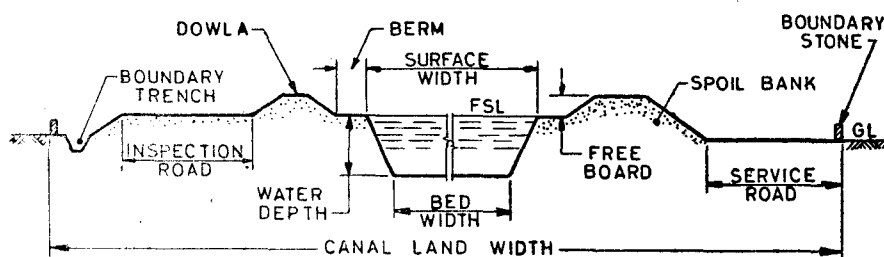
A TYPICAL CROSS-SECTION OF A CANAL
